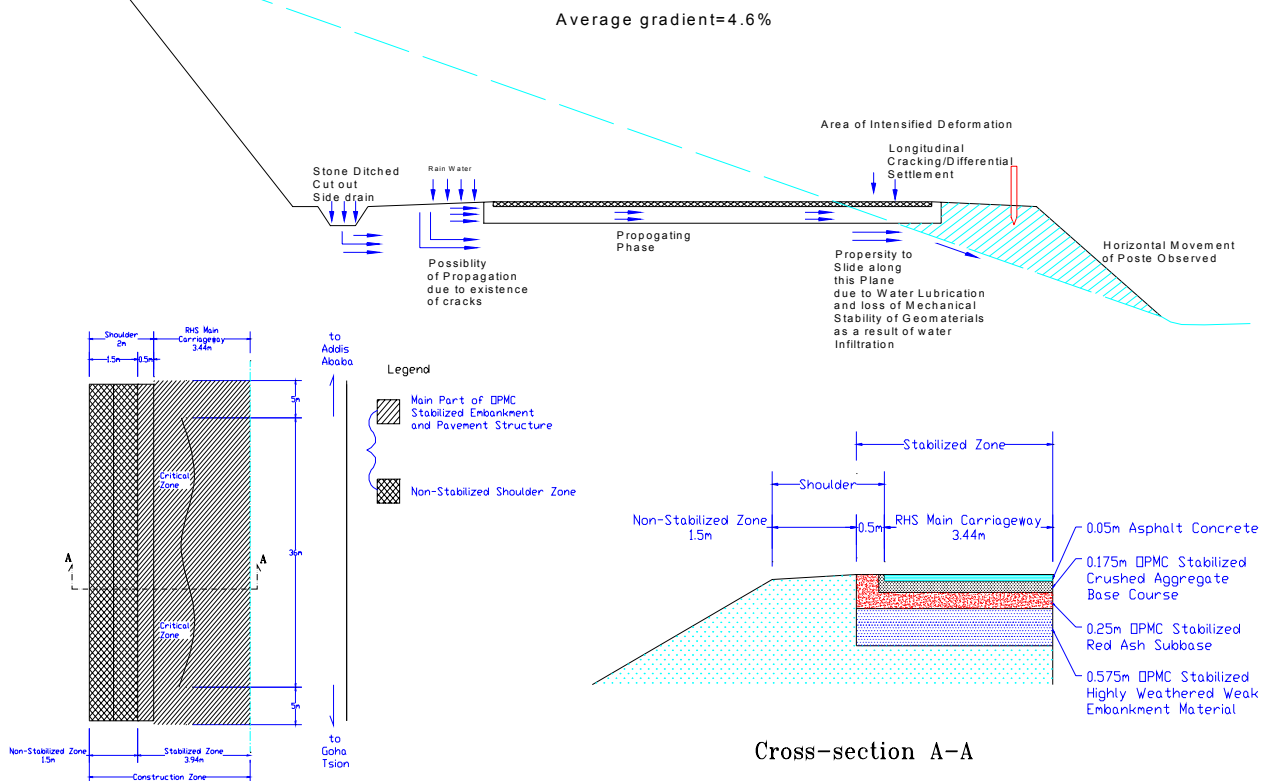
Example of Application of Innovative Techniques in Recycling In-situ Material for Slope Stability, Pavement Structure and Embankment Construction
